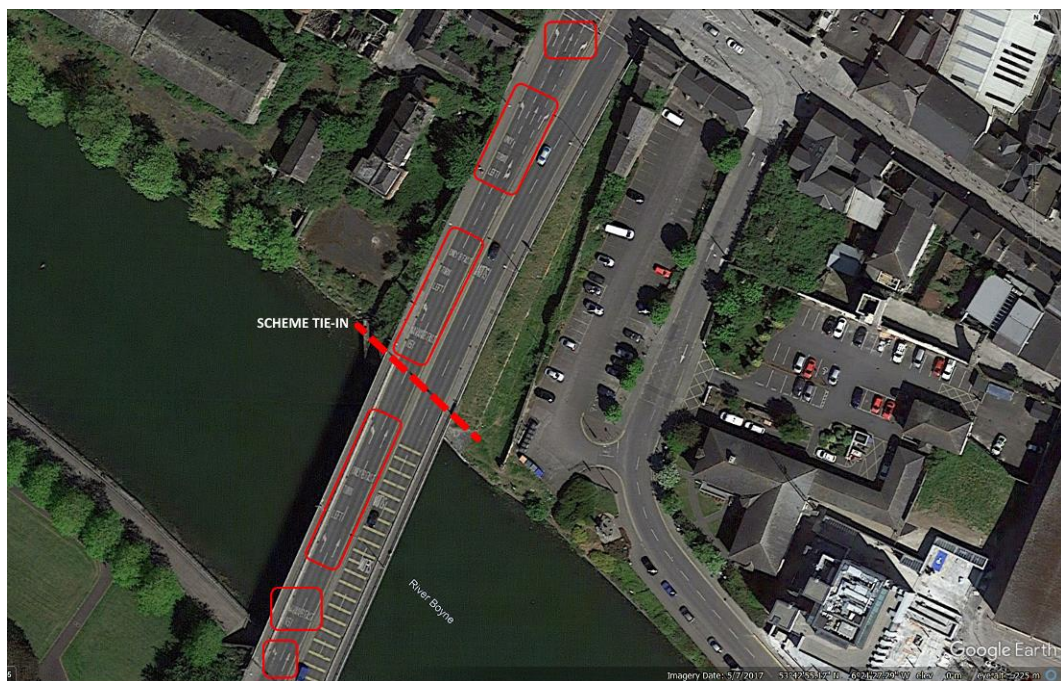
Misleading road markings to south of Scheme Tie-in at Peace Bridge
